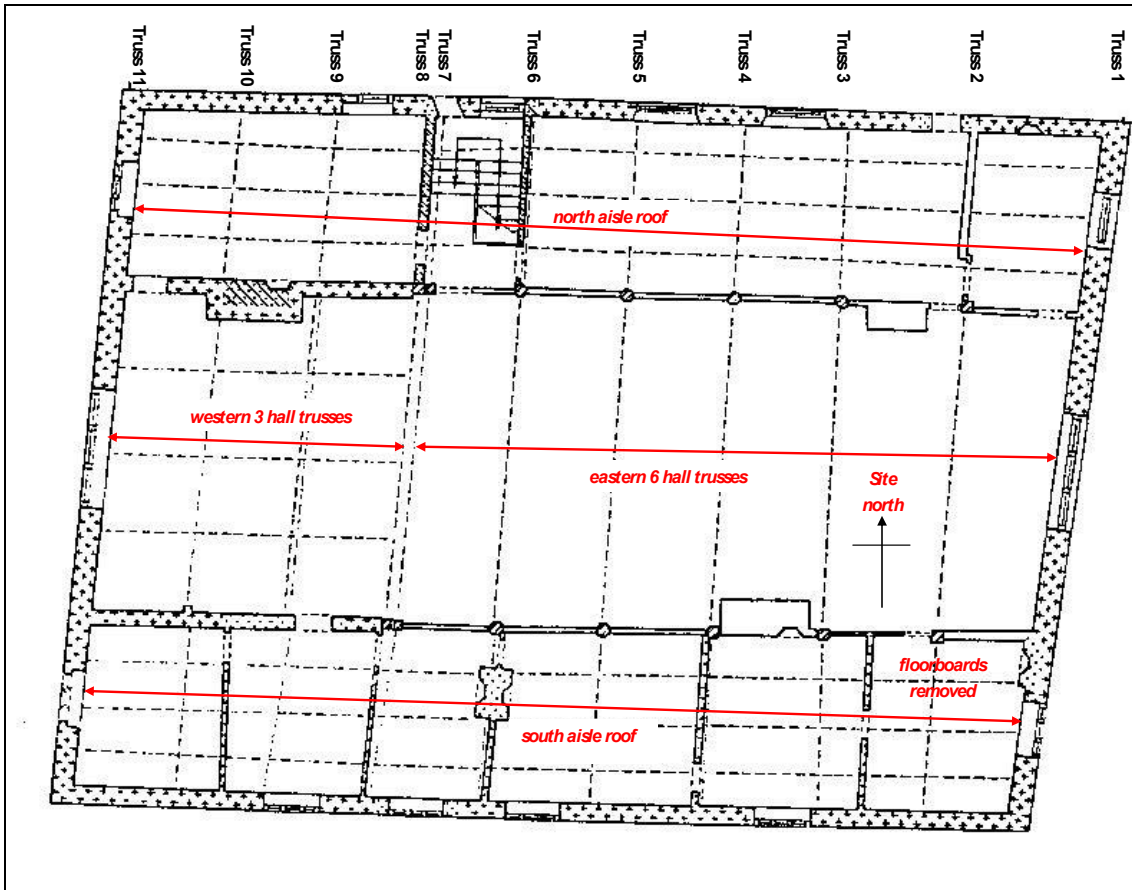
Plan at first-floor level to show layout of building, position of hall trusses, and area of removed floorboards
